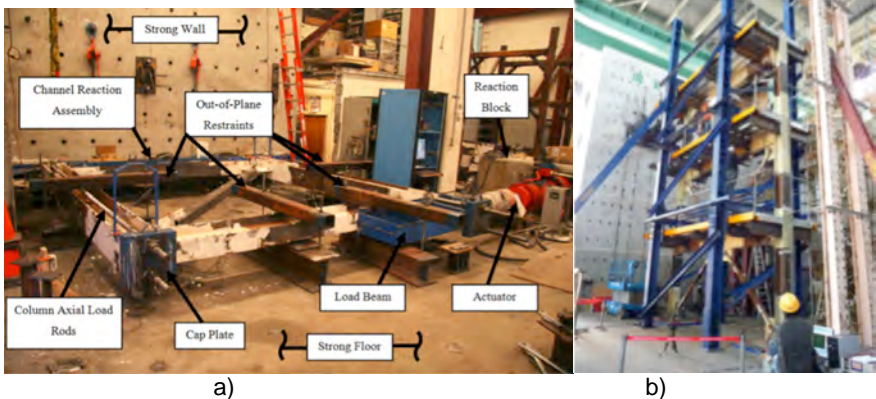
Typical Test Setups, a) Single-Story Single Bay, U of Washington, b) Multi-Story, NCEE
